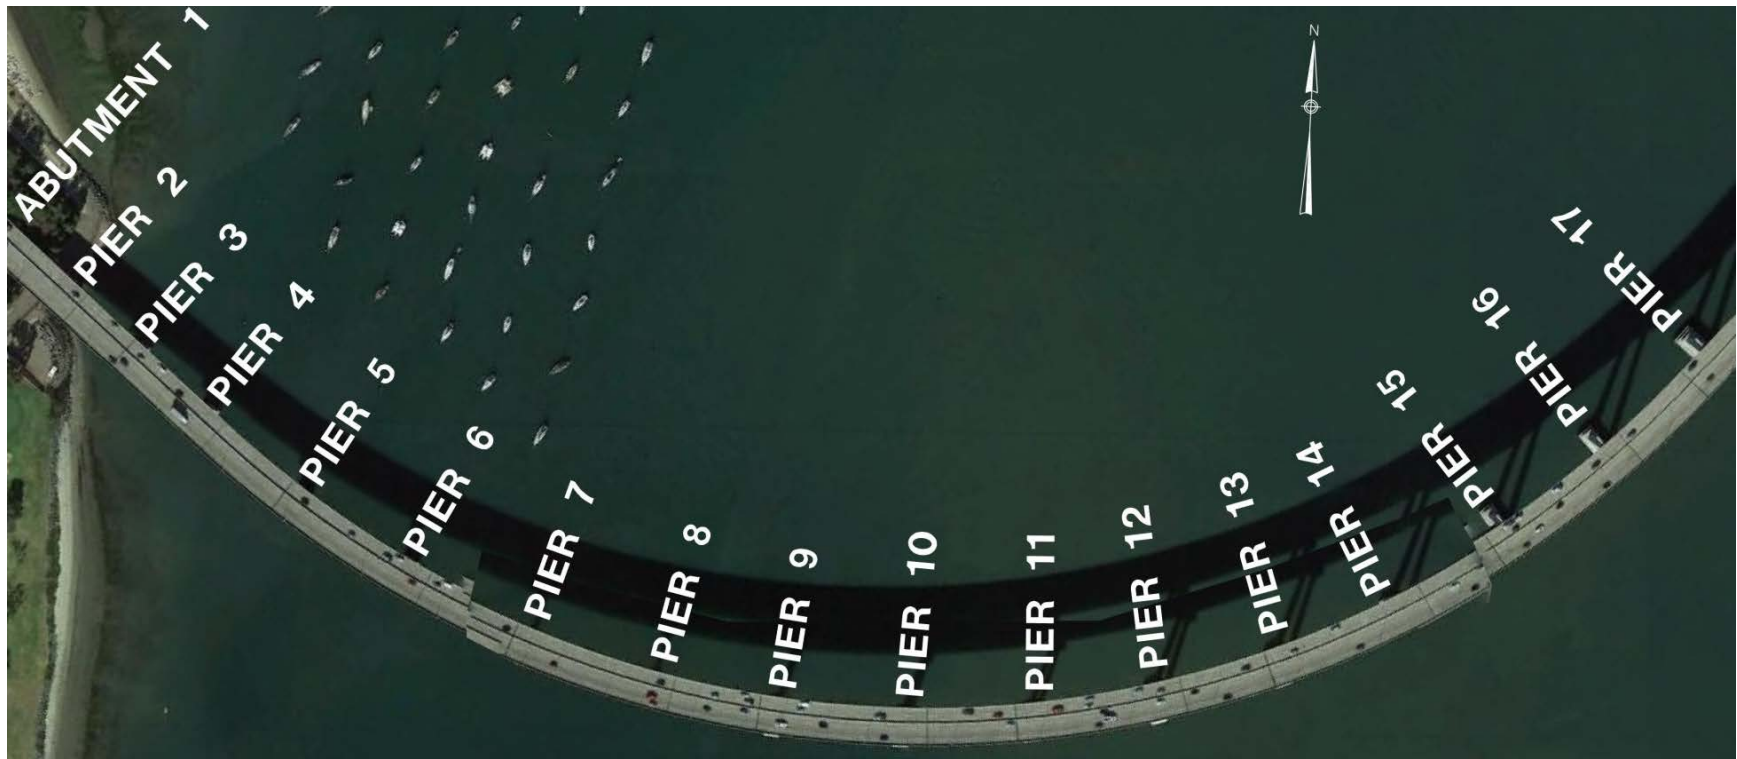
Coronado Bridge Aerial and Elevation (Abutment 1 through Pier 17) – Western Extent to Mid-Span
